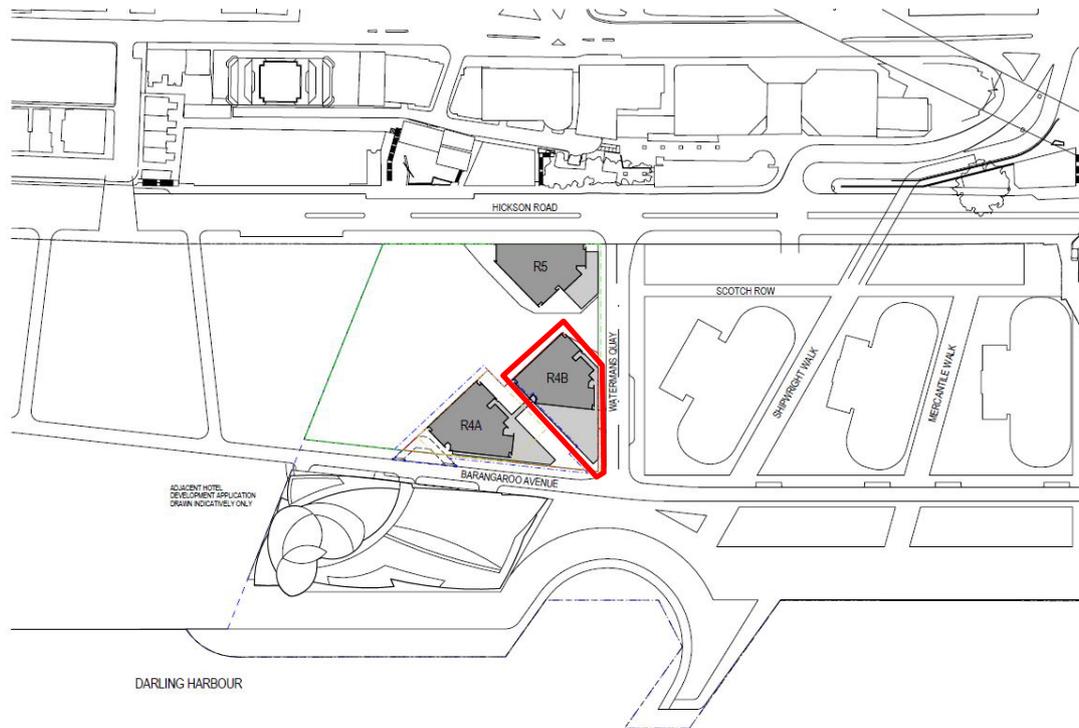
Barangaroo Stage 1B Site Plan. The location of Building R4B is highlighted (not to scale).
